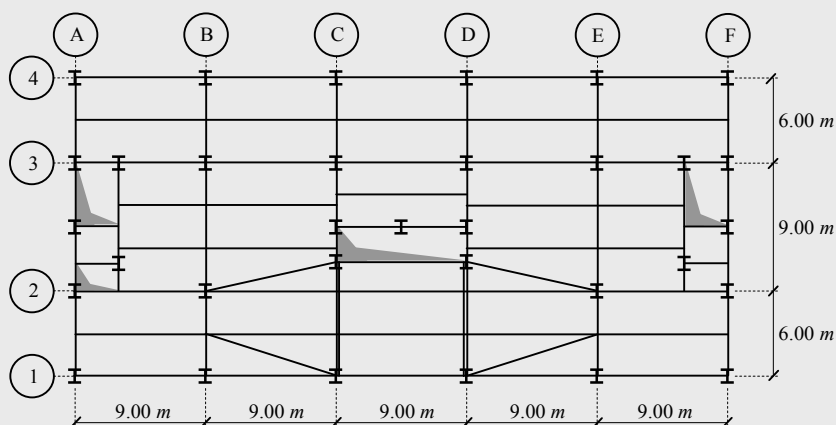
Plan of the 1<sup>st</sup> floor
